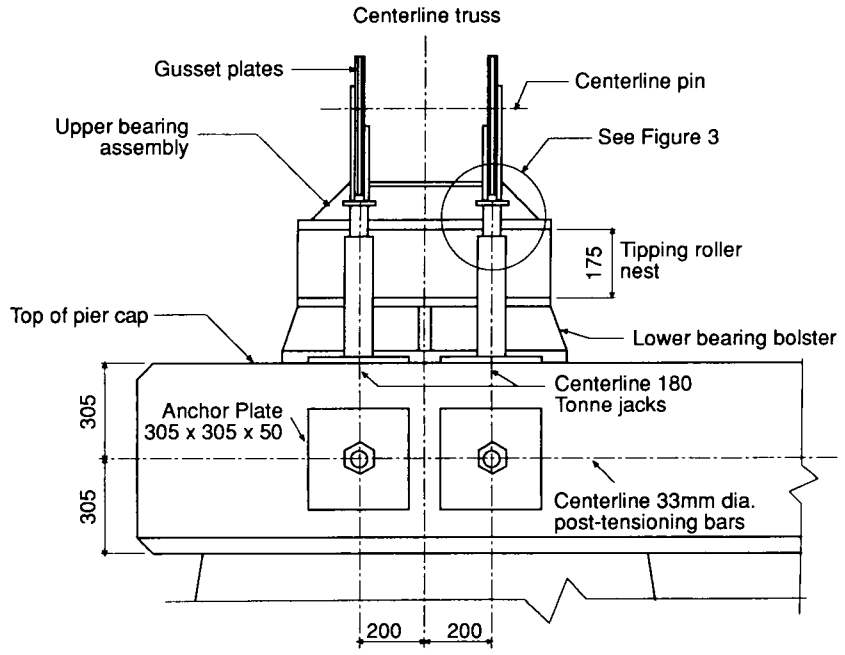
Case Study 1: elevation, Puyallup River Bridge.
